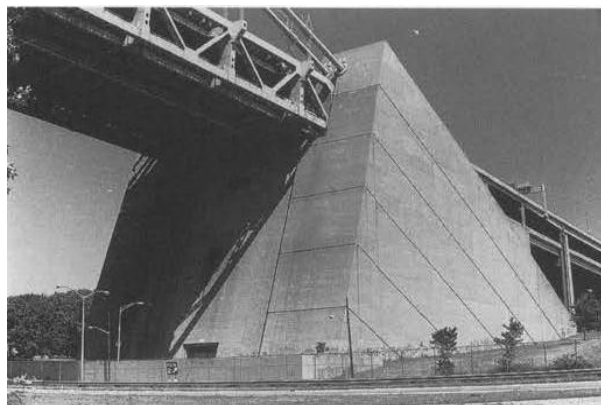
Anchor block of the 1298 m long Verrazano Narrows Bridge (Gimsing, 1998)
